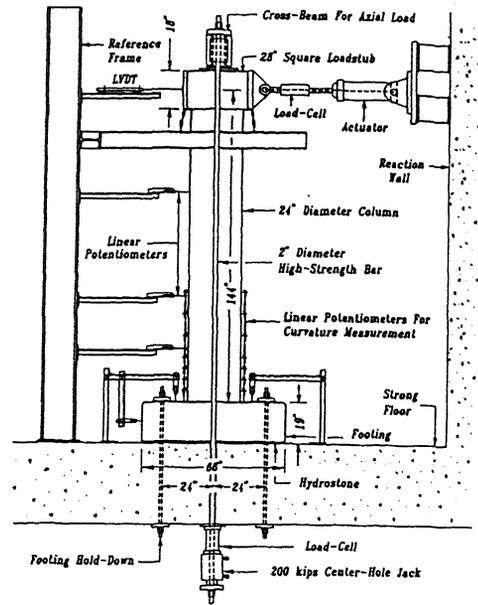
Flexural Test Setup (1 in = 25.4 mm)
